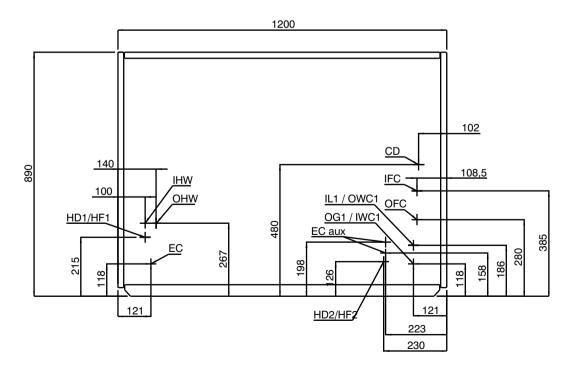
g Refrigerant, water and electrical connections PX047-051-057-044-054-062-074-092 A-D, top view
